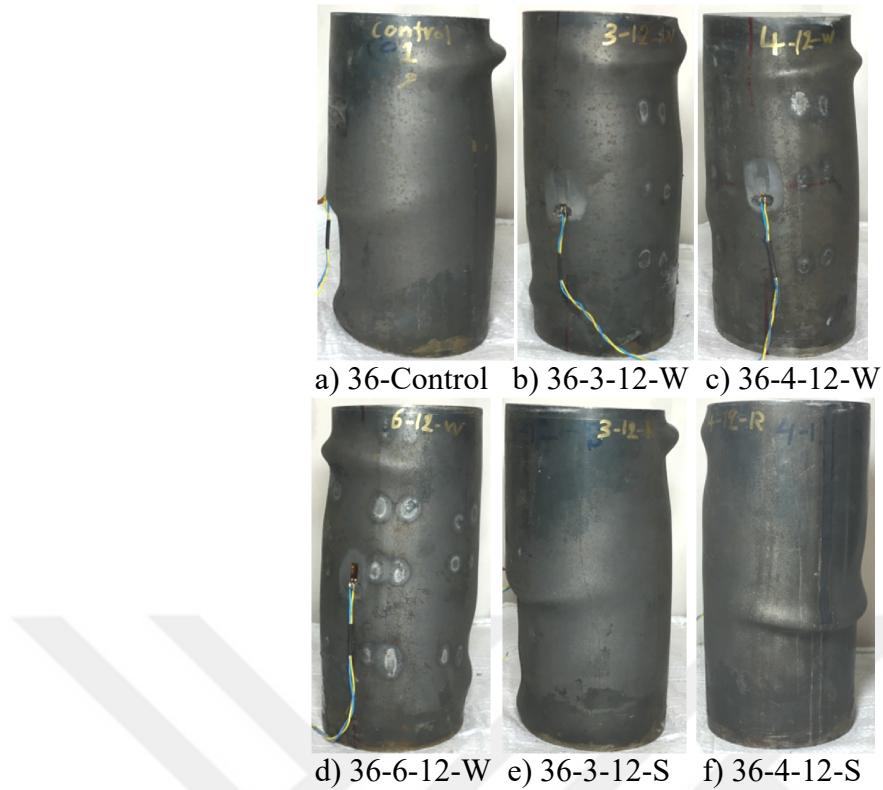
Failure mode of 3.15 thickness steel tubes with $\phi 12$ mm reinforcing bars specimens
